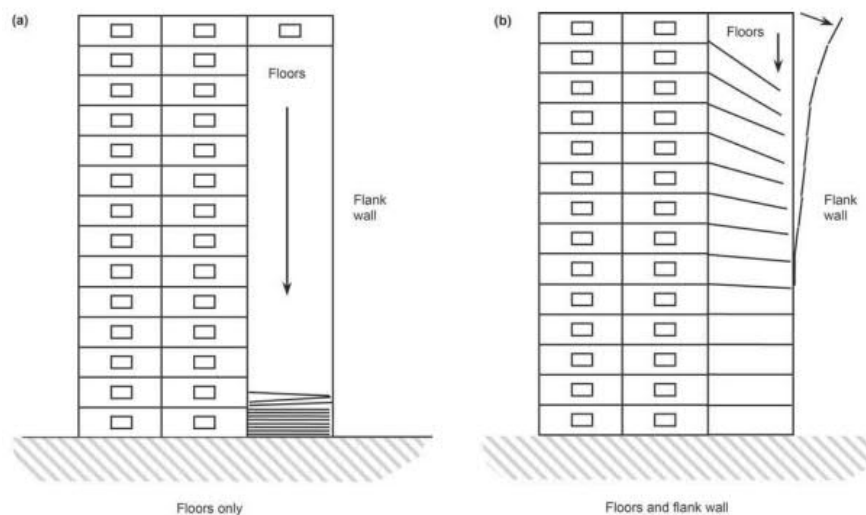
Schematic showing some possible progressive collapse failure modes in a typical LPS dwelling block for a high-level trigger site
